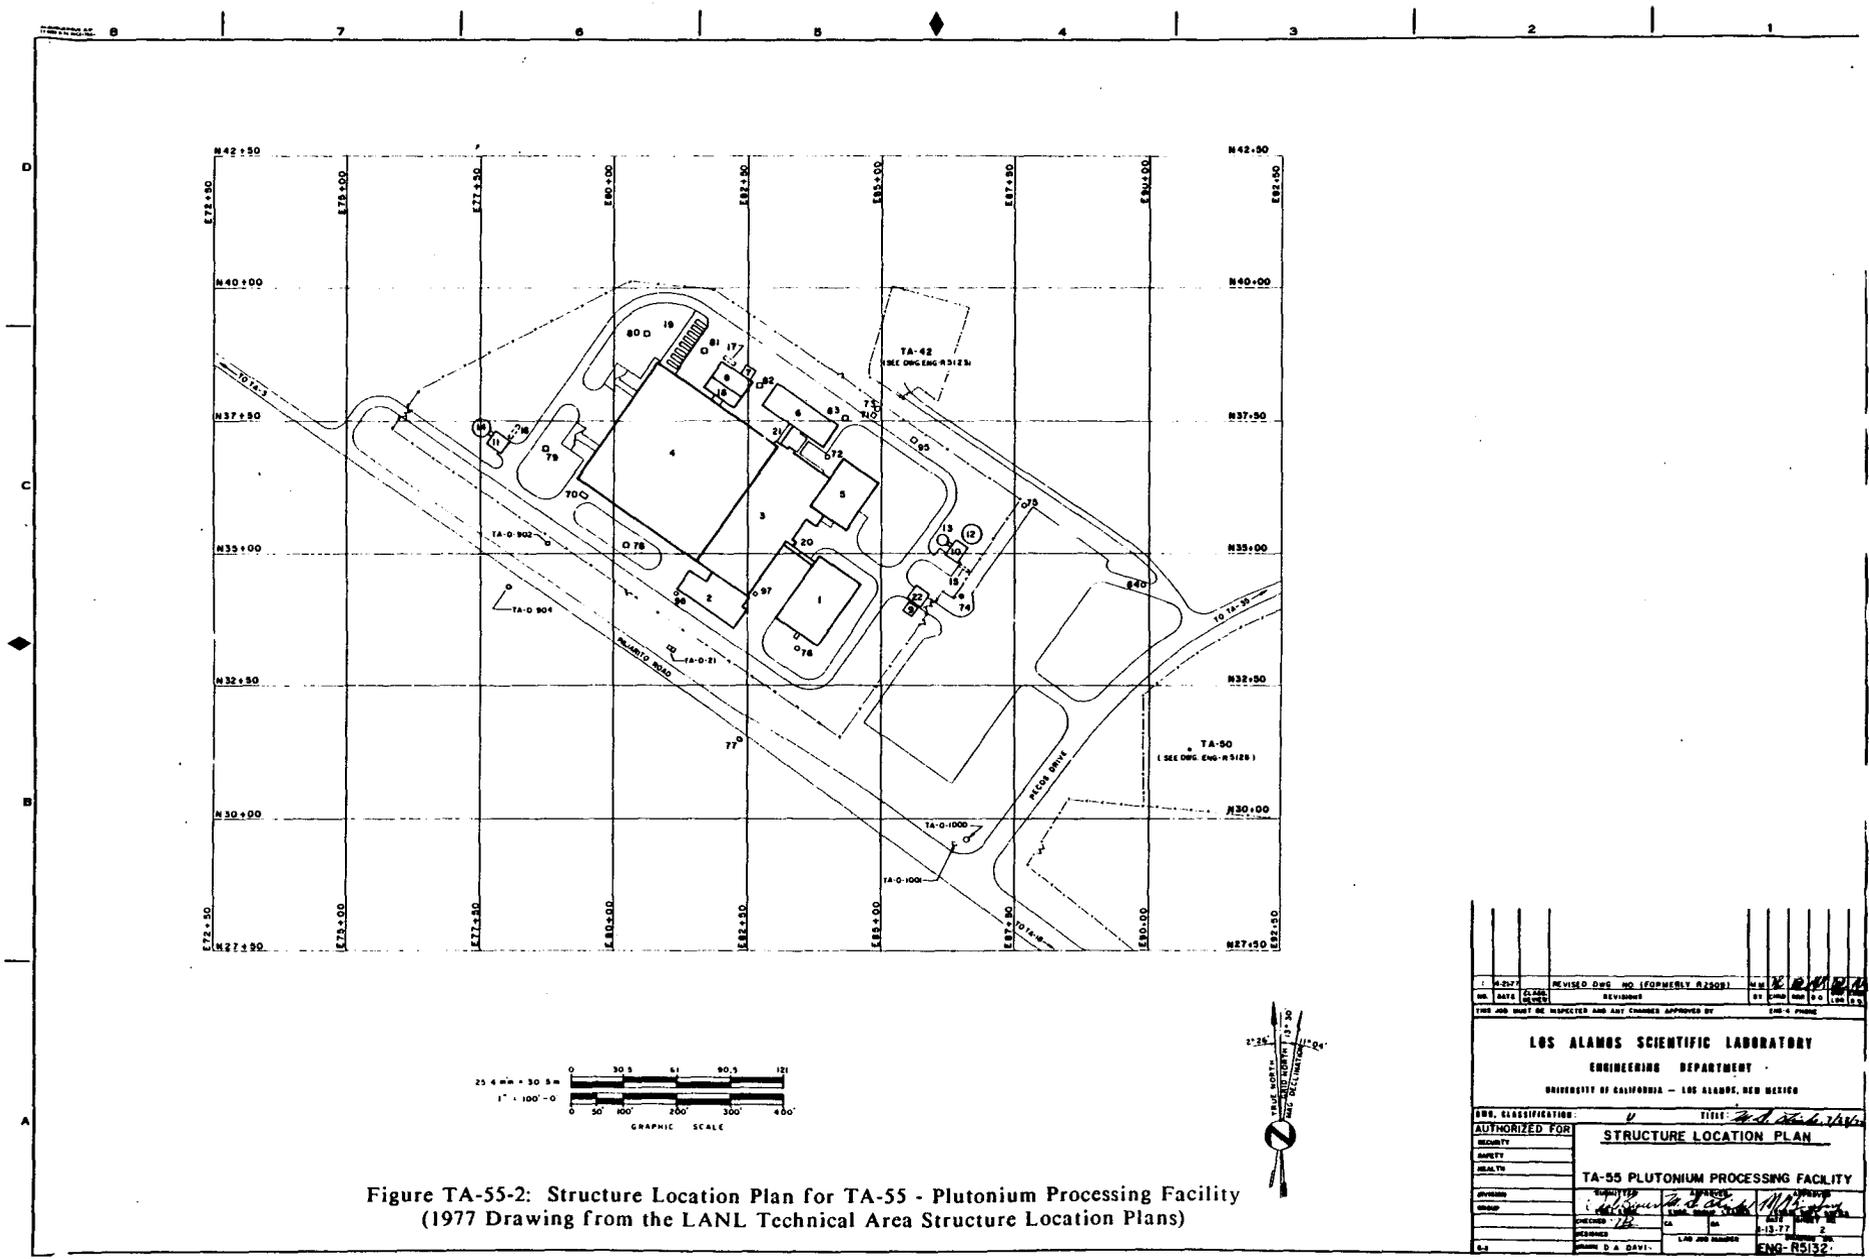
Structure Location Plan for TA-55 - Plutonium Processing Facility (1977 Drawing from the LANL Technical Area Structure Location Plans)
